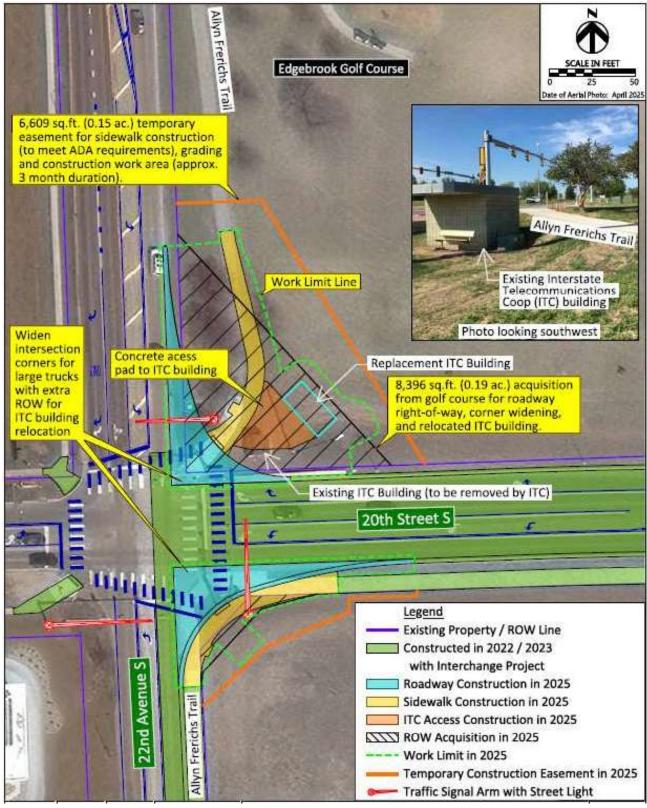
ITC Building, Golf Course, and Trail at the 20th St South and 22nd Ave Intersection
